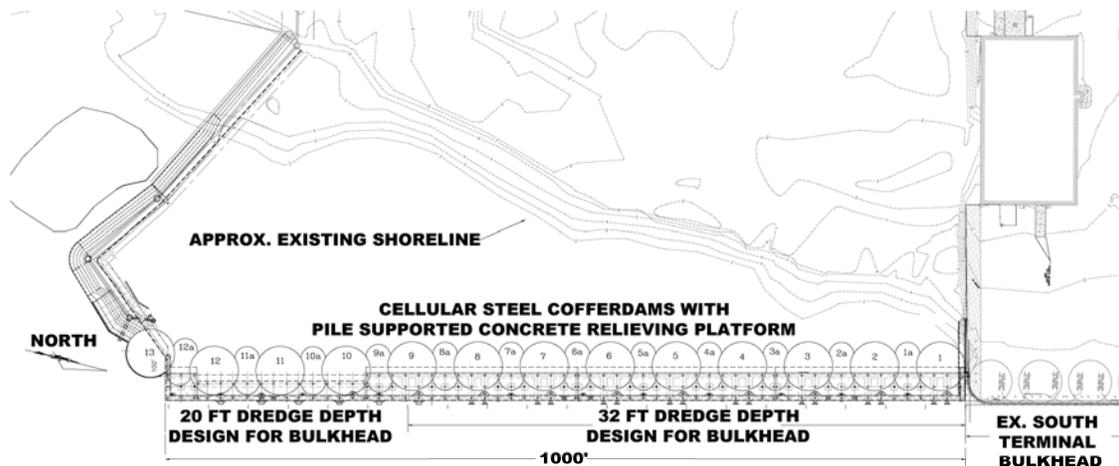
Cellular Steel Cofferdams and Pile Supported Relieving Platform
